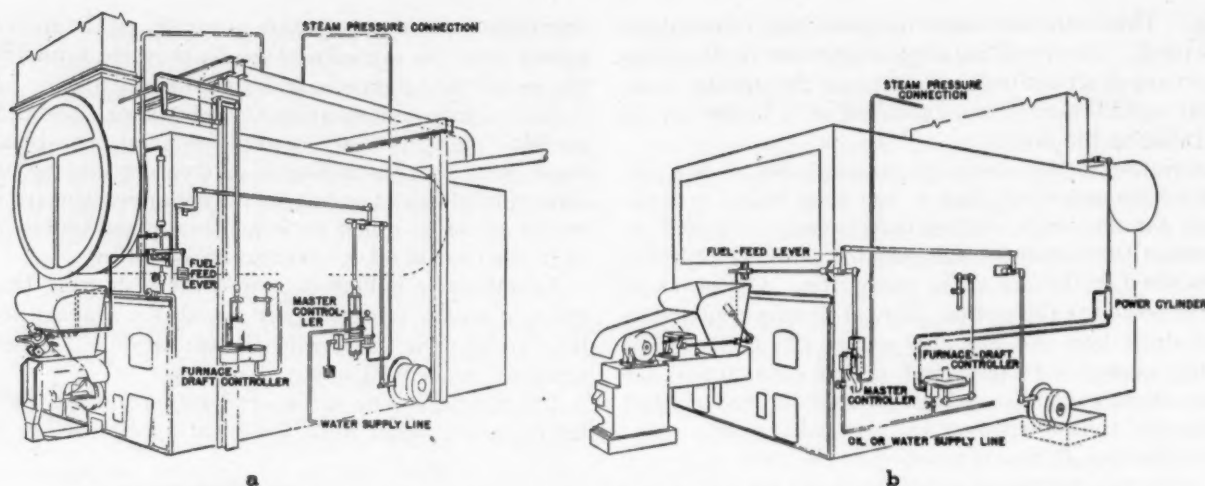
Two types of "positioning" control applied to stoker—*a*—steam drive; *b*—motor drive
